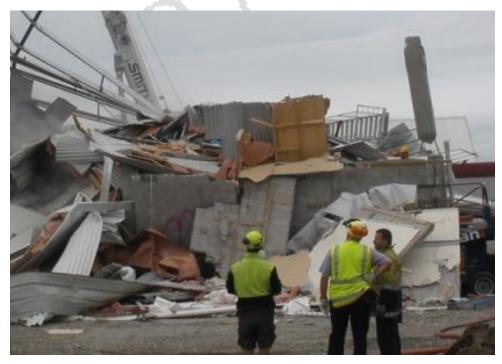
South west corner (Grid A/I) with corner column still standing. Collapsed work platform under wall panels.
